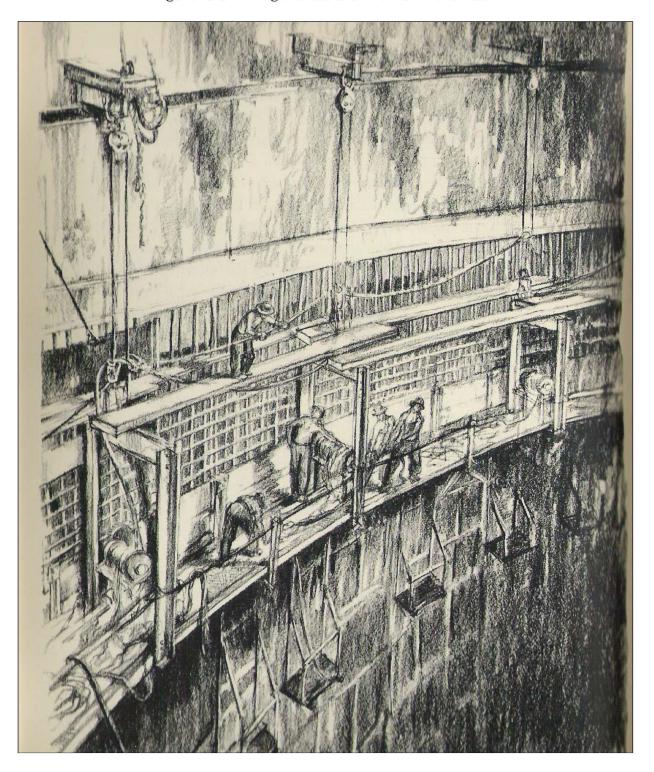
is a sketch showing workers lining the walls of the tank chamber. Reinforced concrete was placed against the rock and smoothed continuously; welded steel plate formed the inner liner.
